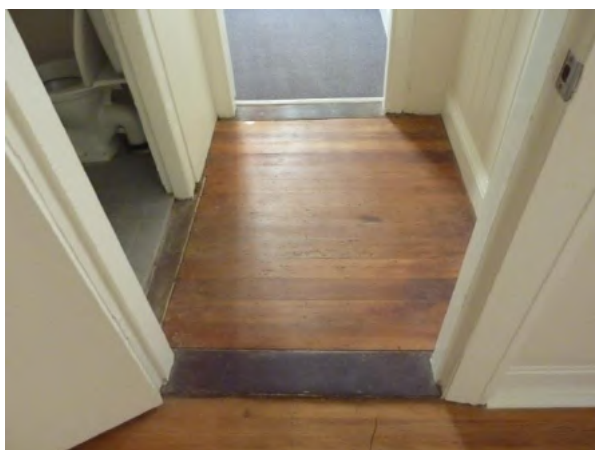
The floor of the former porch has been raised to be flush with the original timber door thresholds (ground floor level, Flat 48). (Source: GML 2015)
